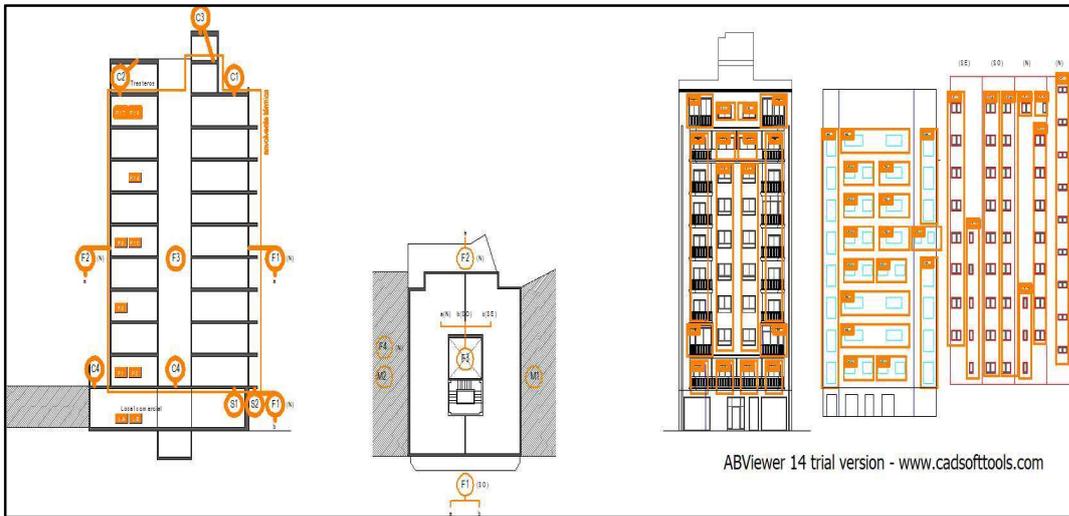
AutoCAD plans of the building to be worked on. Source: AutoCAD.
